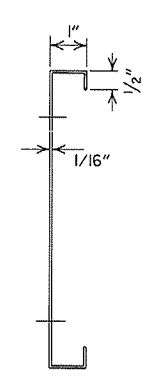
DETAIL OF TERMINAL ANCHOR POST (TYPE I)
